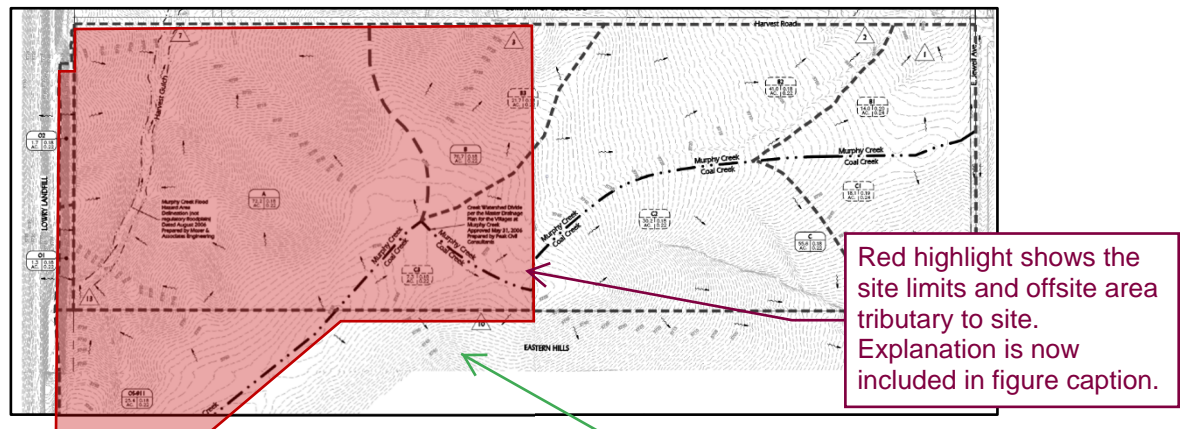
Snip of Master Drainage Plan (Full size in Appendix A-1)
